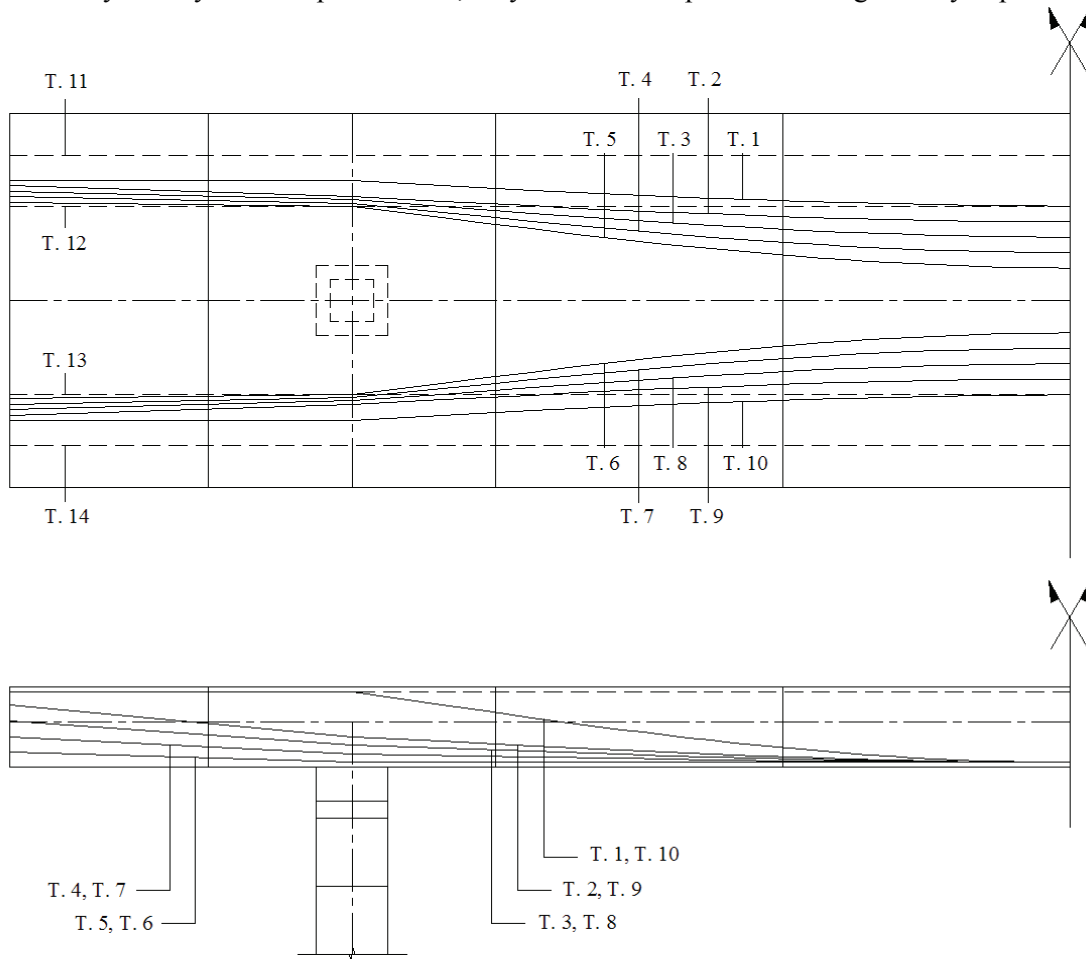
Plan and elevation view of tendon geometry along the superstructure
